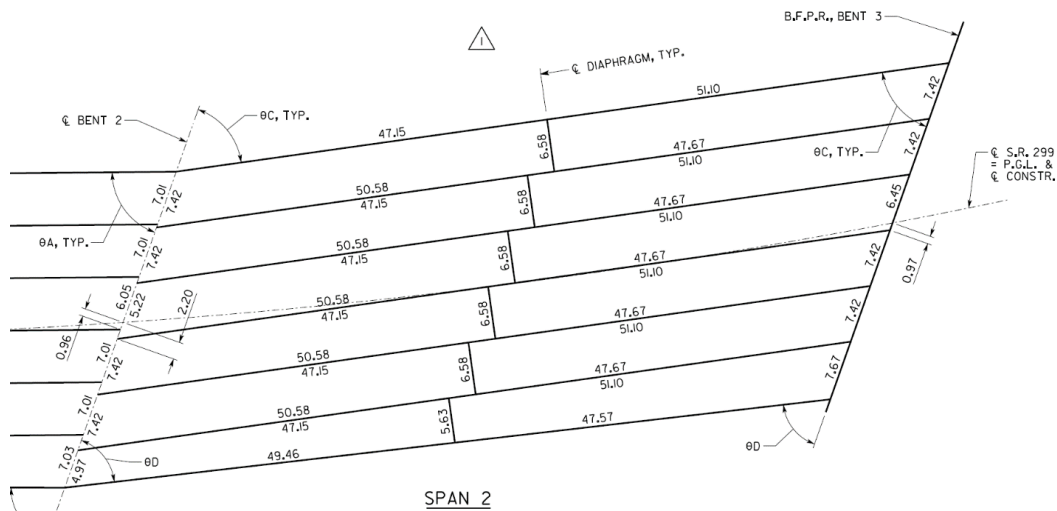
Plan view showing Span 2 PSC girders (GDOT-DRW, 2016).
